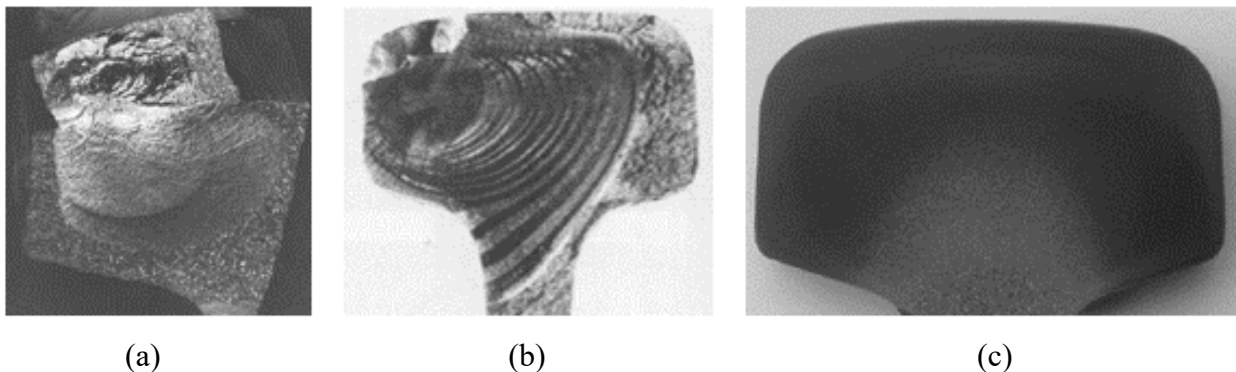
(a) Longitudinal shell fracture and transition into the detail fracture; (b) Detail fracture [13]; (c) Microstructural gradient produced by the heat treatment in modern rails [16]
